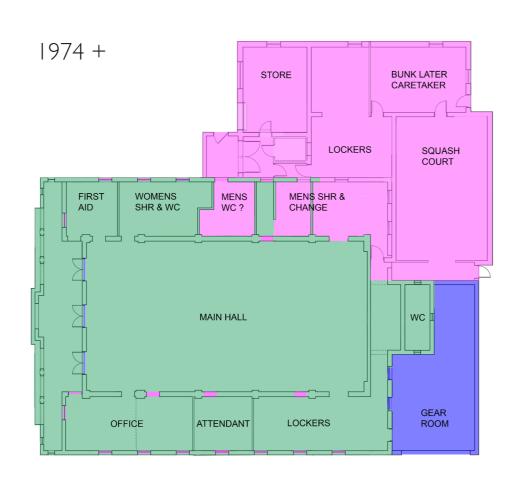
BUILDING GROUND FLOOR PLANS
